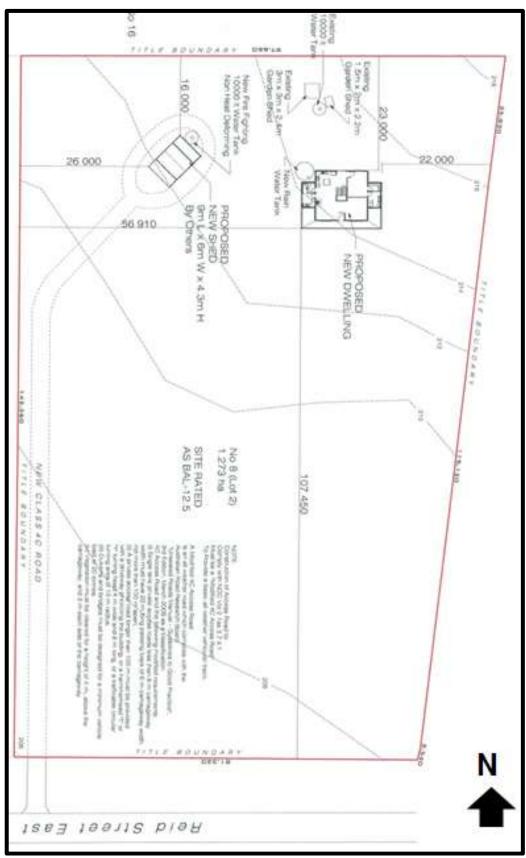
proposed site plan (Nicholas Fitsialos, 2017)
